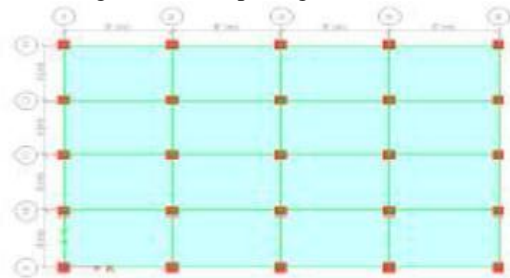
Structural model of G+14 storey building in ETAB(plan view)
